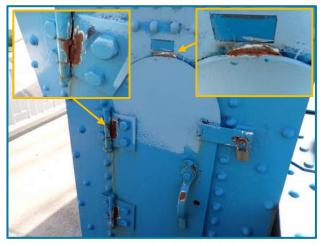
Tower C access hatch welded shut at the north sidewalk due to broken hinges (looking east).
